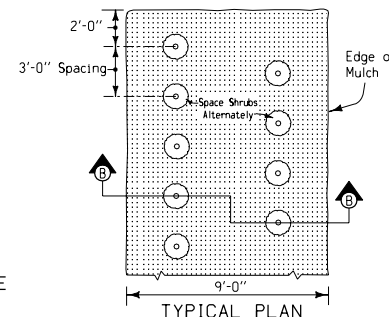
DETAILS OF PLANTING OF IRREGULAR SHRUB GROUPS
